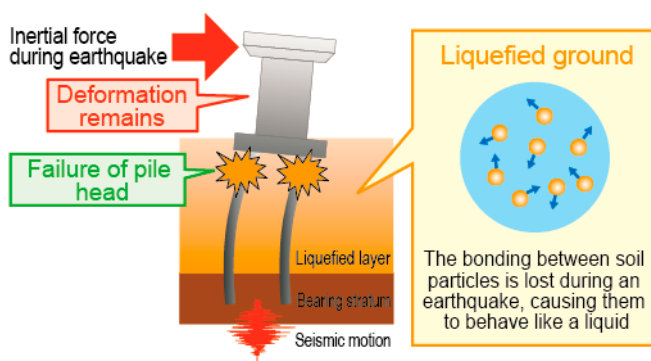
Damage to pile foundations from ground liquefaction
